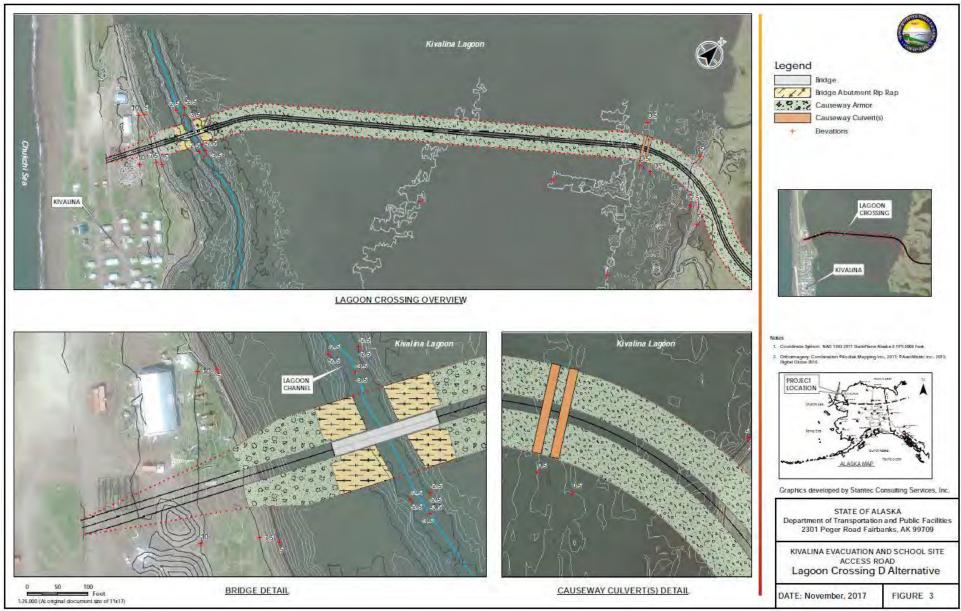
Detail of the proposed 0.98-km Kivalina Lagoon Causeway, including the lagoon channel bridge (bottom left) and northeastern culvert configuration (bottom right).
